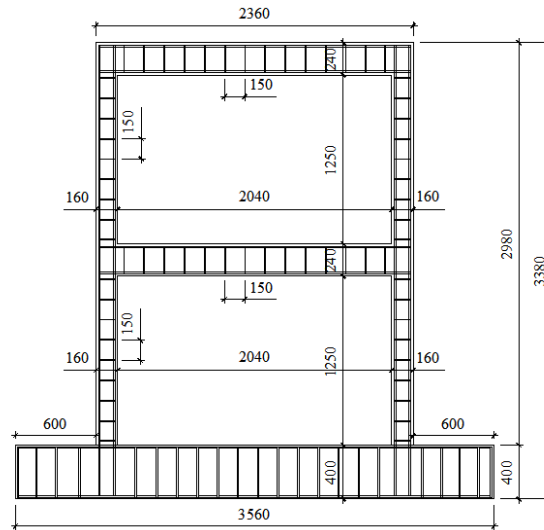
The dimension and reinforcement scheme of test frames (Dimensions are in mm.)
